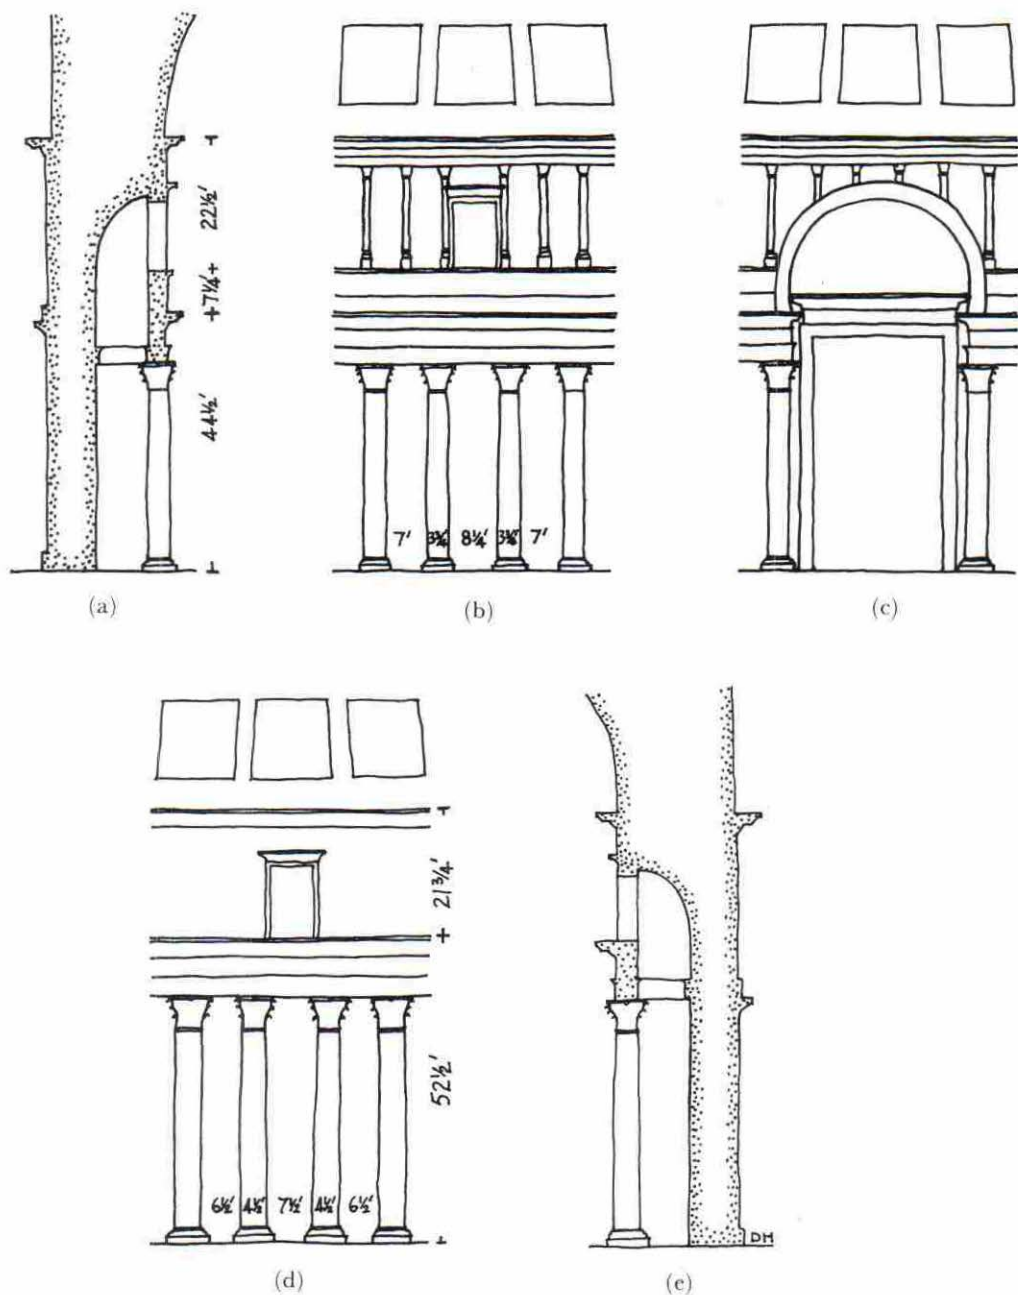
(a) Lateral exedra as built: section; (b) Lateral exedra as built: elevation; (c) Entrance exedra as built: elevation; (d) Lateral exedra as intended (?): elevation; (e) Lateral exedra as intended (?): section
